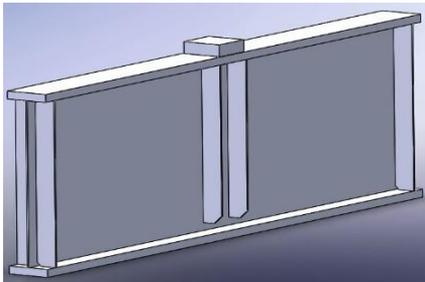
Plate Girder with two stiffeners spaced at 50 mm ea. side of load application
